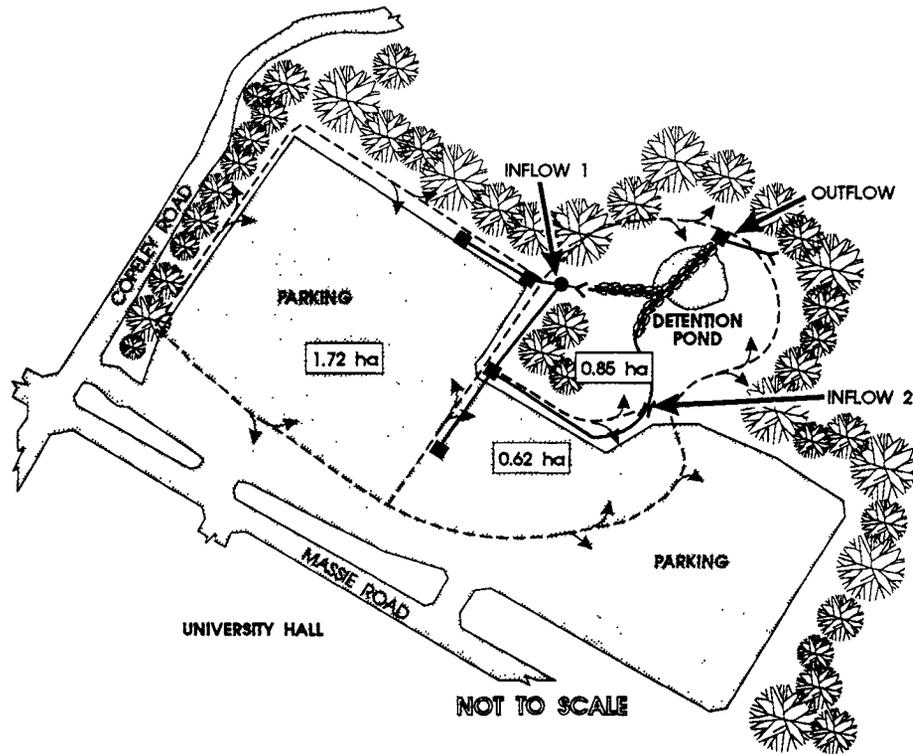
SKETCH OF MASSIE ROAD PARKING LOT AND DETENTION POND.
